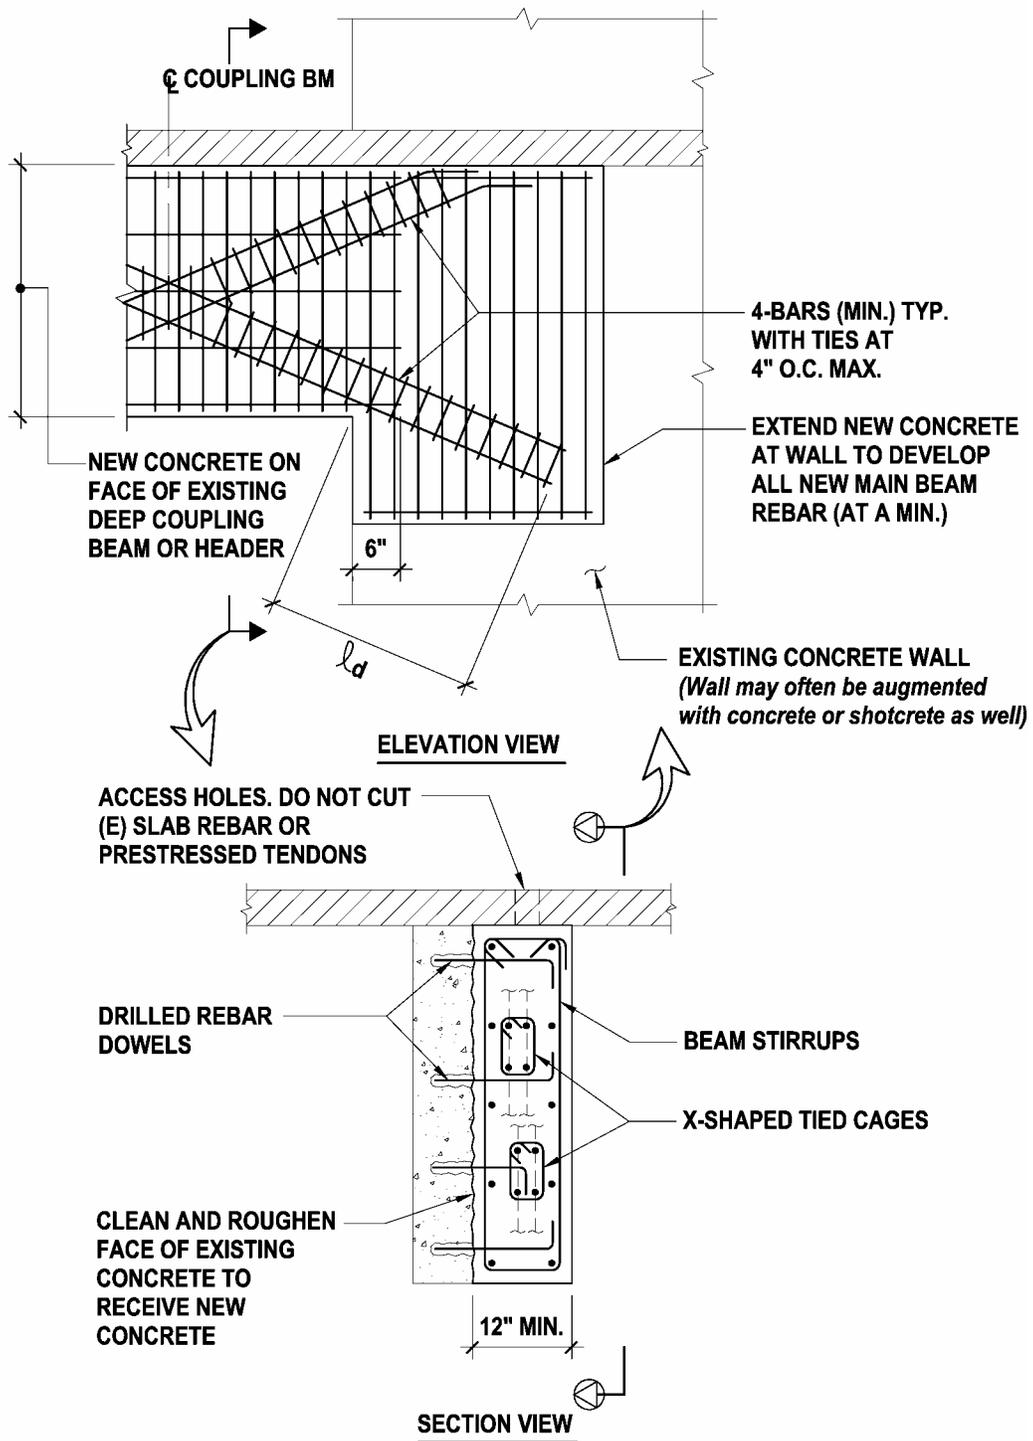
Strengthening of Deep Coupling Beam
